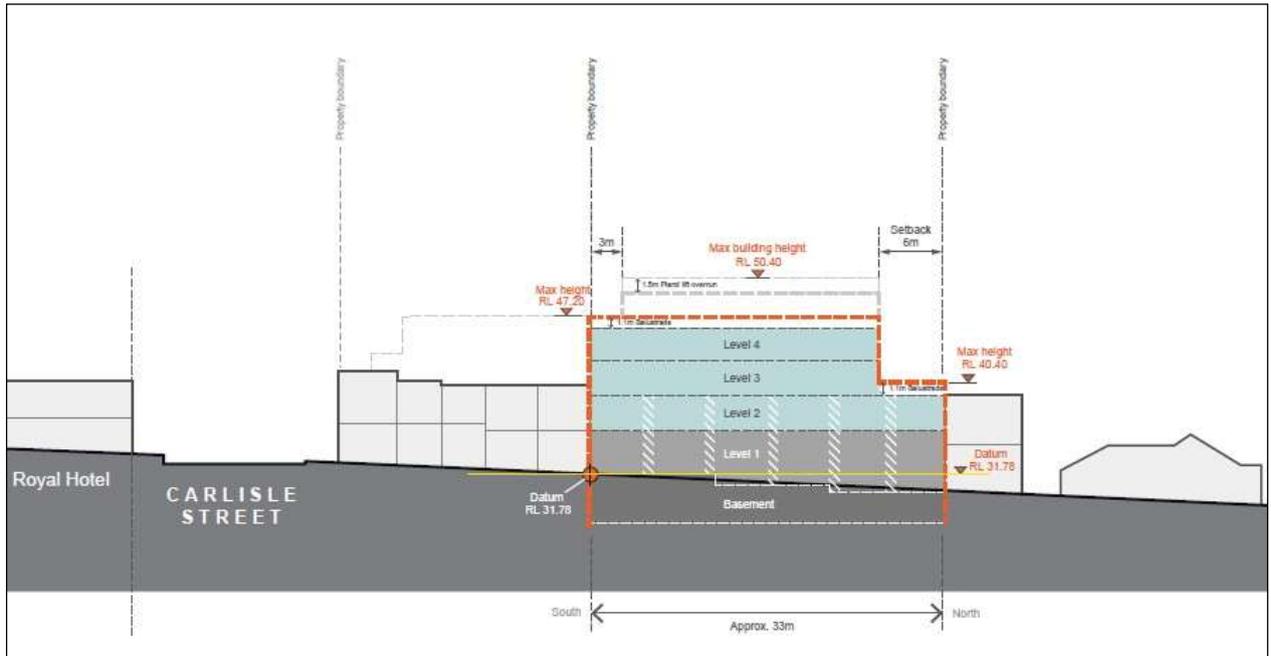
Building heights and Massing envelope - Section A (Norton St elevation)
